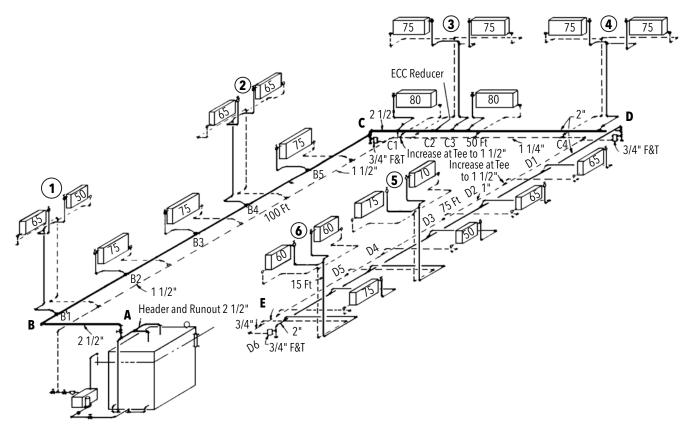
(See detailed drawings - Figures 102A, 102B and 102C)
